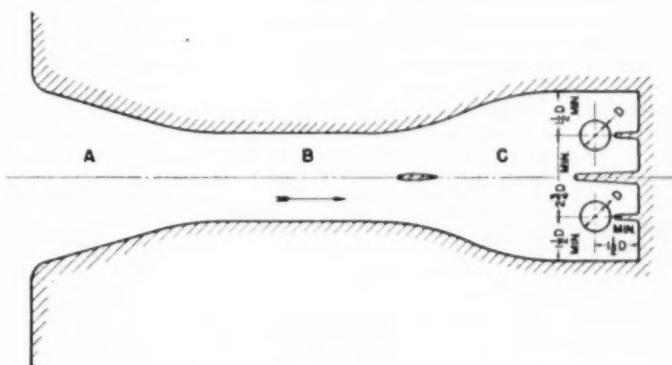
TYPICAL PUMP INSTALLATION AND INTAKE DESIGN
